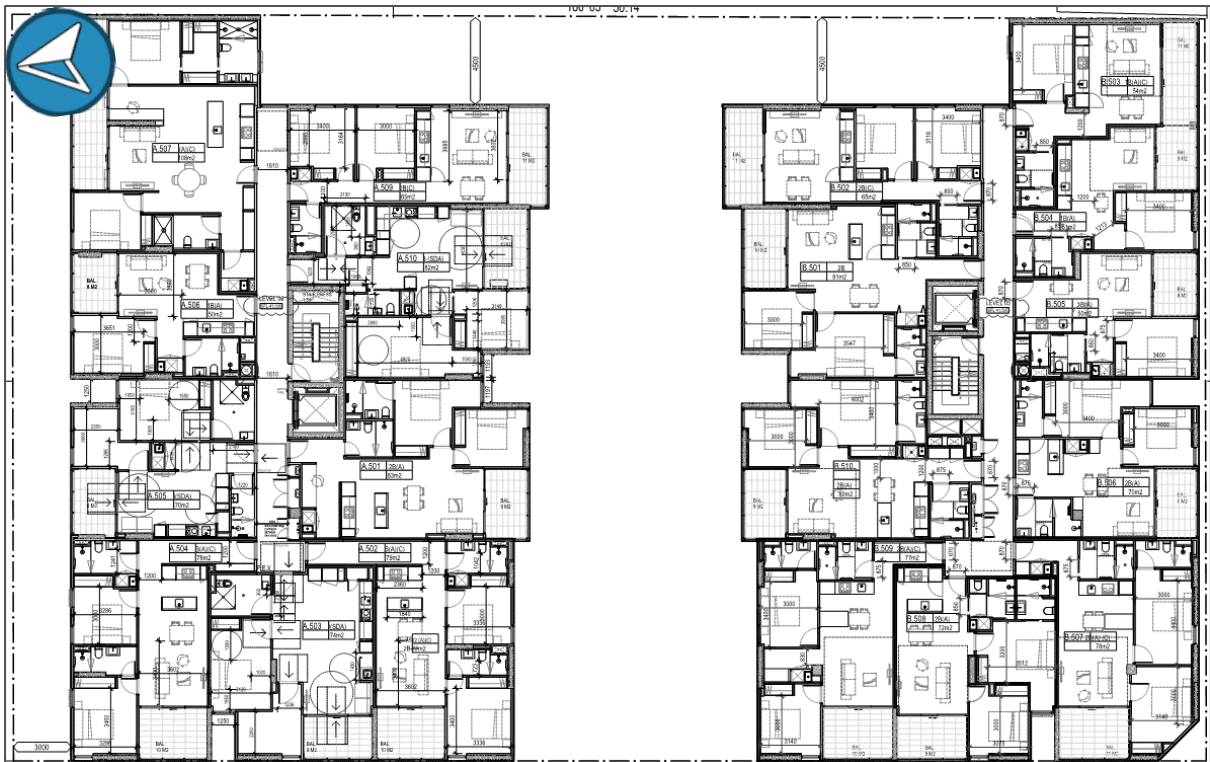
Proposed Floor Plans – Level 5 (Image Source: Artisan Architects)
